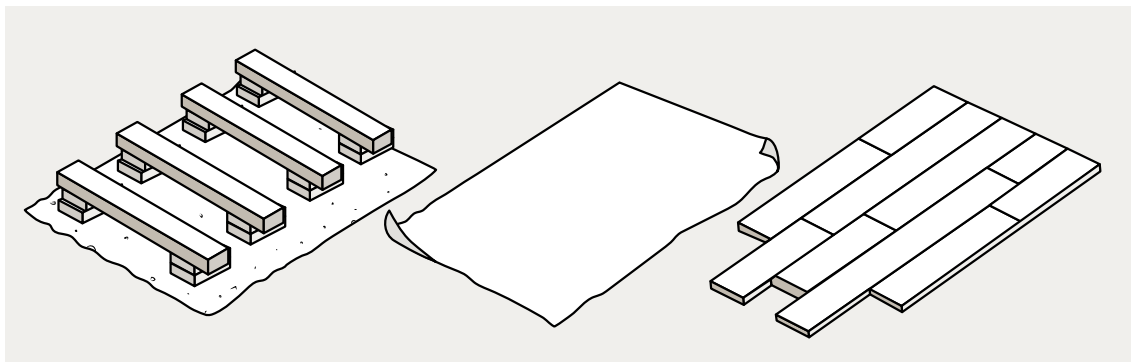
subfloor, joists, Sizalkraft builders paper, wood floor planks
